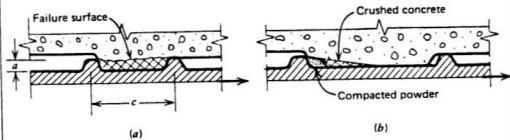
Failure mechanisms at the ribs of deformed bars
